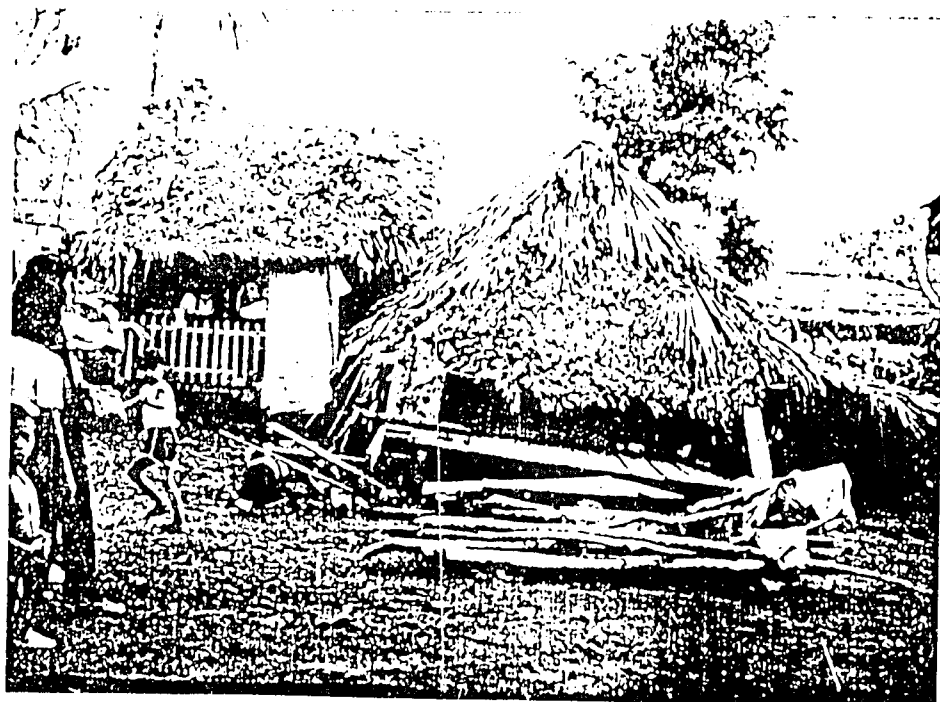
i. Collapsed house with roofing still intact near Barangay Marioc
